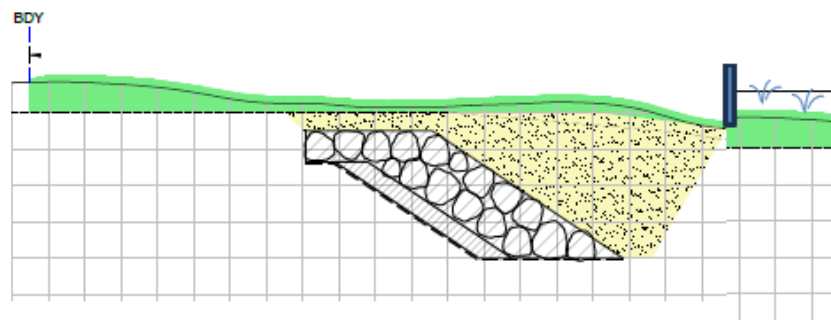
Completed Northern Wall section (Figure 7.2b from the Construction Methodology Statement, Davis Coastal Consultants, October 2024; page 15).
